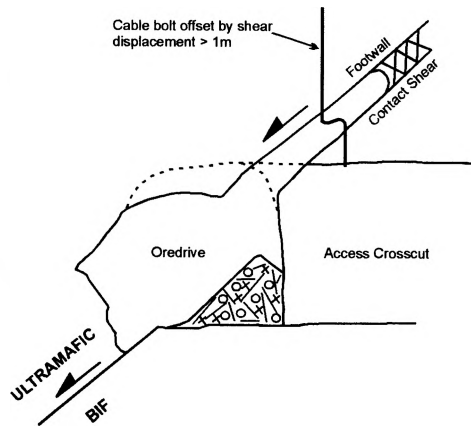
Cross section showing interpretation of ground behaviour in Figure 8. The hangingwall has sheared down dip relative to the footwall.
